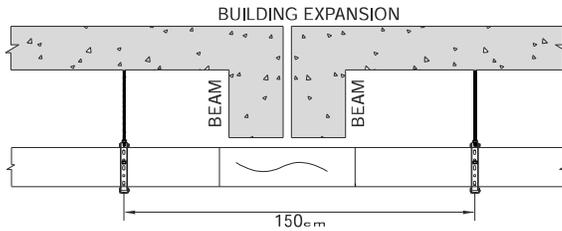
YDT BUILDING EXPANSION APPLICATION
